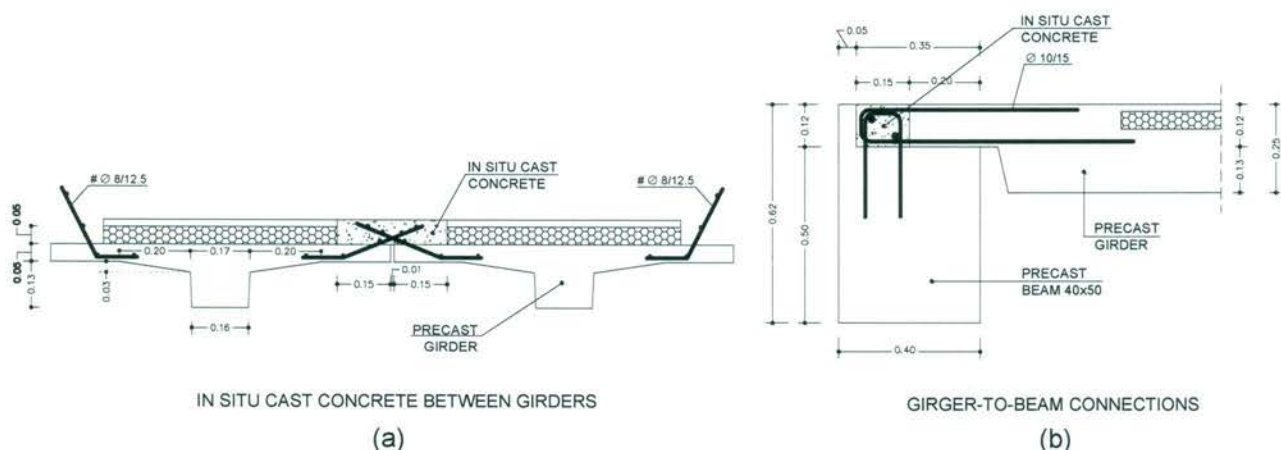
Specimens 4 and 5: (a) detail of the in situ cast concrete between girders (vertical section); (b) detail of the girder-to-beam connection (vertical section).
